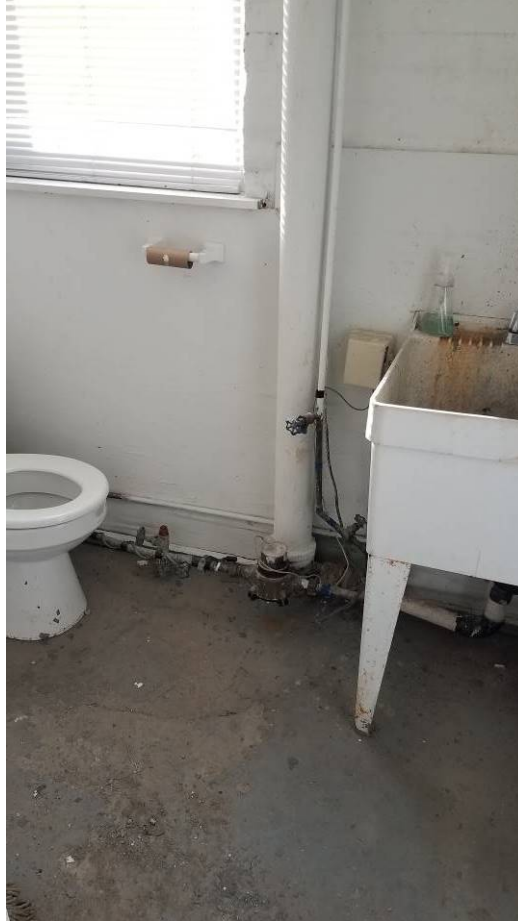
View of first floor bathroom, vertical sewer line from second floor
